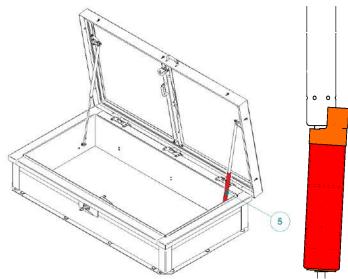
mcr PROROOF ST roof access hatch with locking tube (5). Locking tube in locked position.
